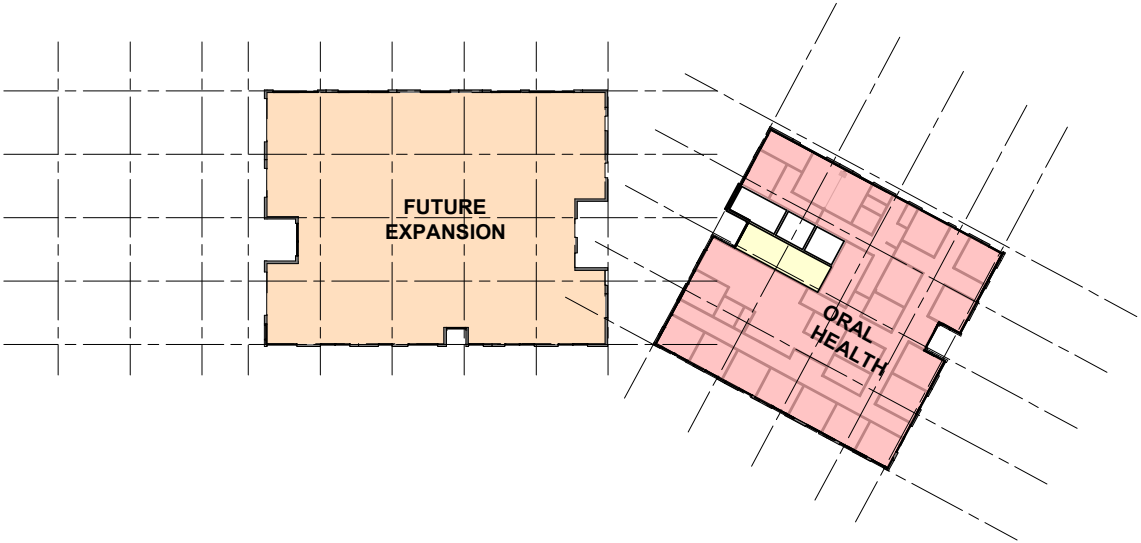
Health Hub, Floor Plan - Level 1, Block & Stack
